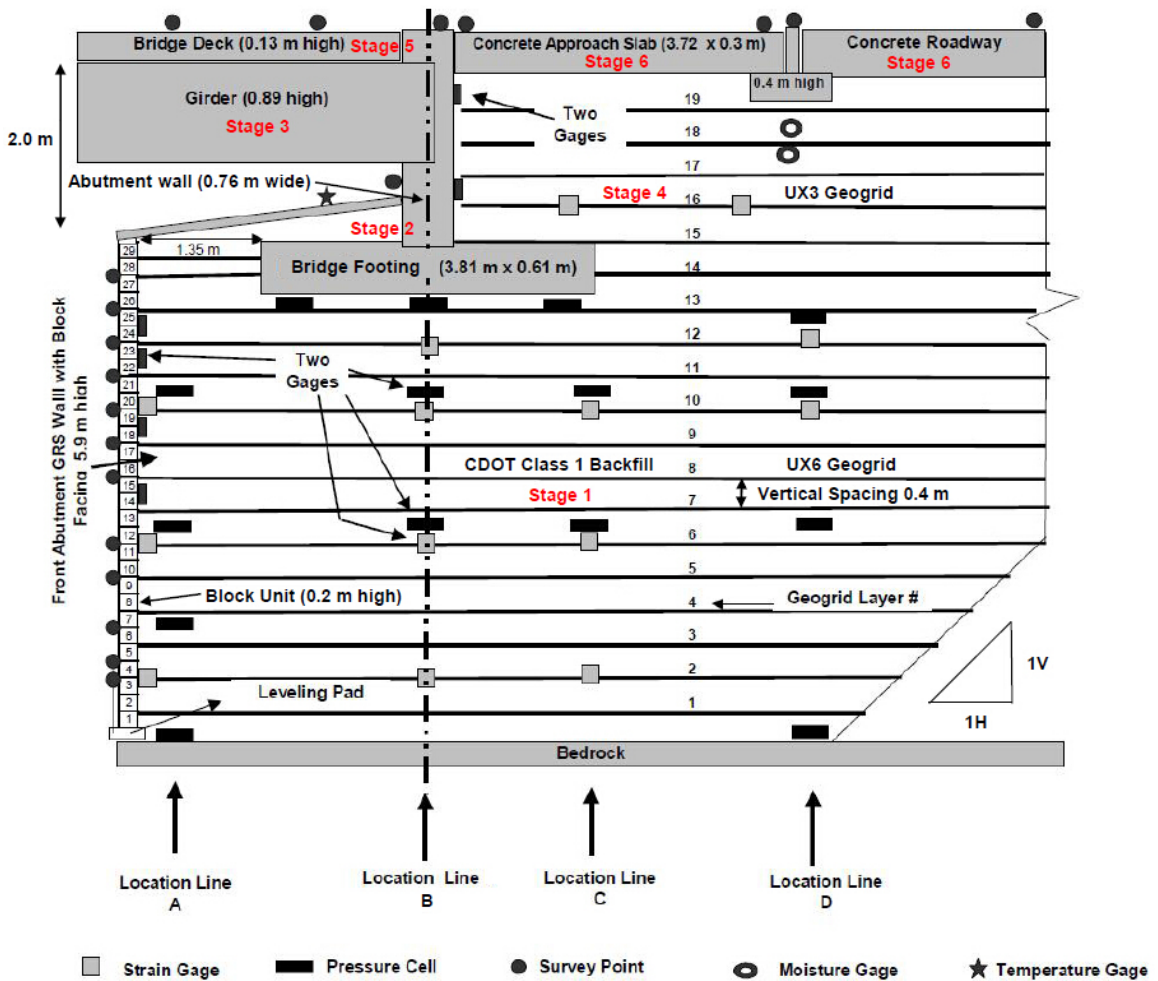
Instrumented Section 800 for the Founders/Meadows east bridge abutment (adapted from Abu-Hejleh et al. 2002).
